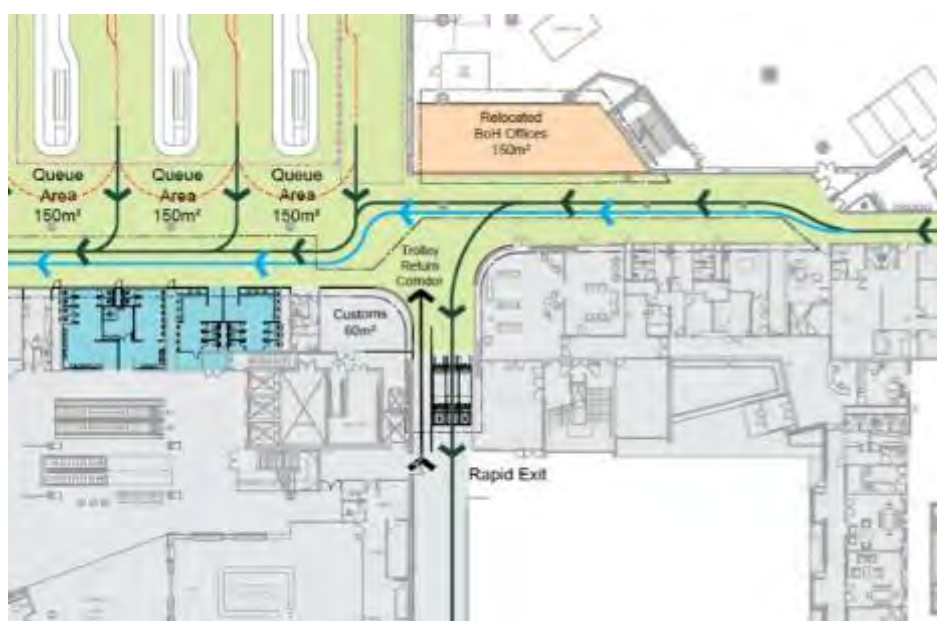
Proposed Rapid Exit at Terminal 1 Baggage reclaim hall
